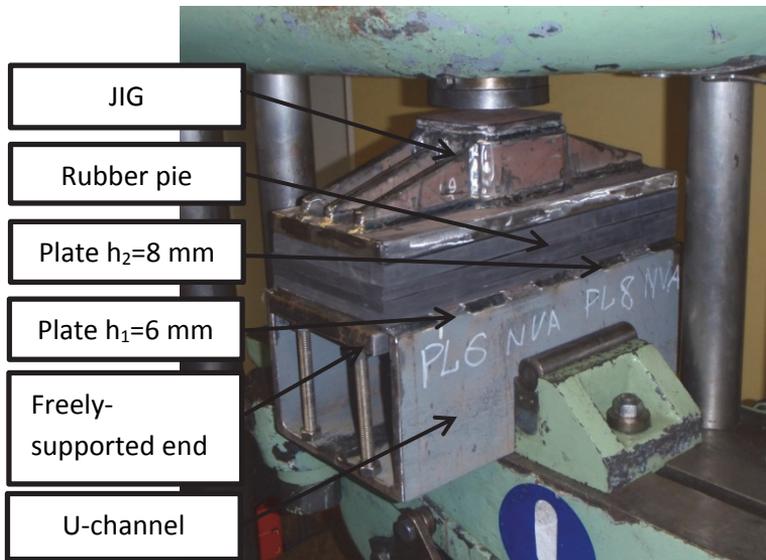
Plate with variable thicknesses of 6 mm and 8 mm welded to the U-channel installed on the table with the rubber pie, the hinge and the jig.
